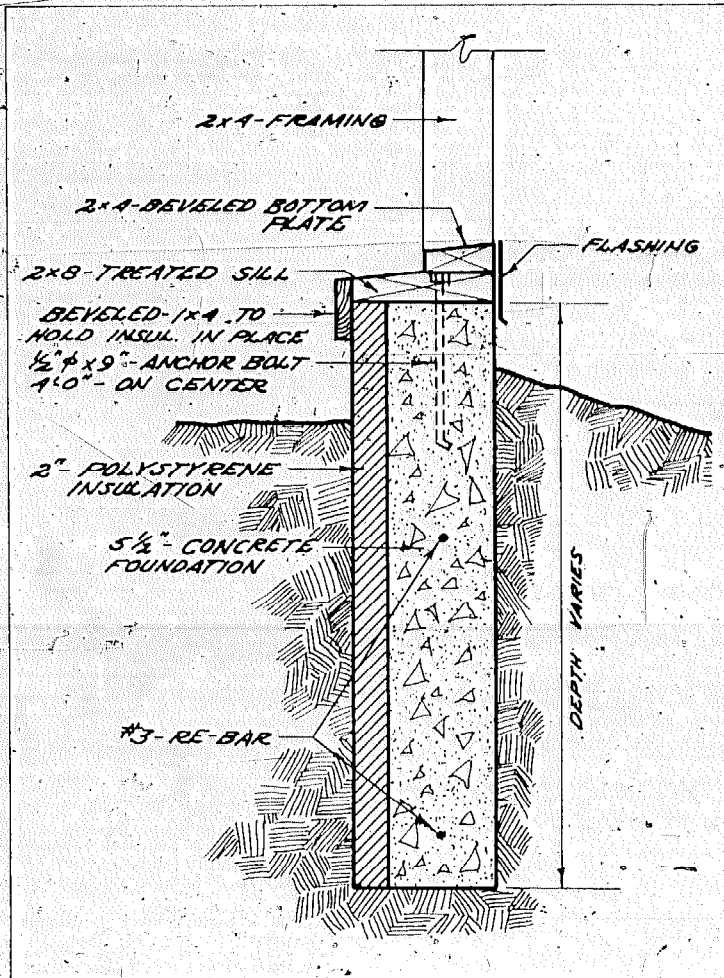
B Concrete foundation wall without footing — for use in very stable soils (shown with insulation on the inside of the wall)
